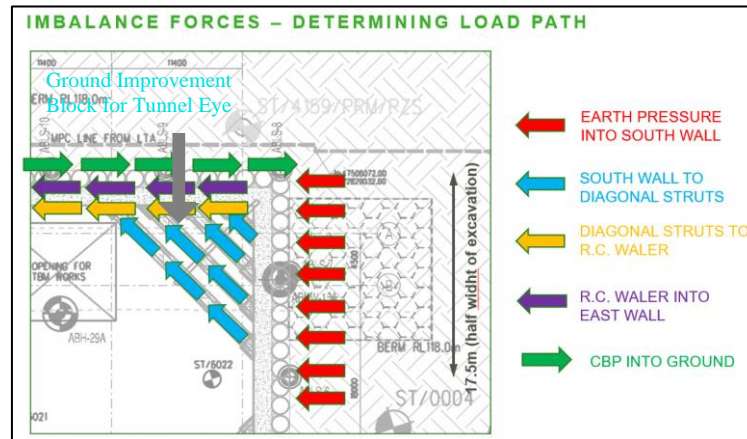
Expected Load Path from South CBP Wall to East CBP Wall
